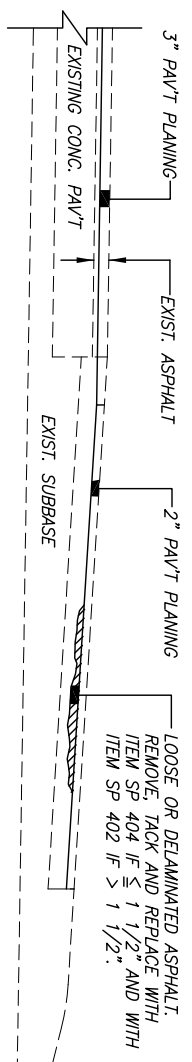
DETAIL 'C' - AT MEDIAN EDGE OF PAVEMENT - NORMAL SECTION
